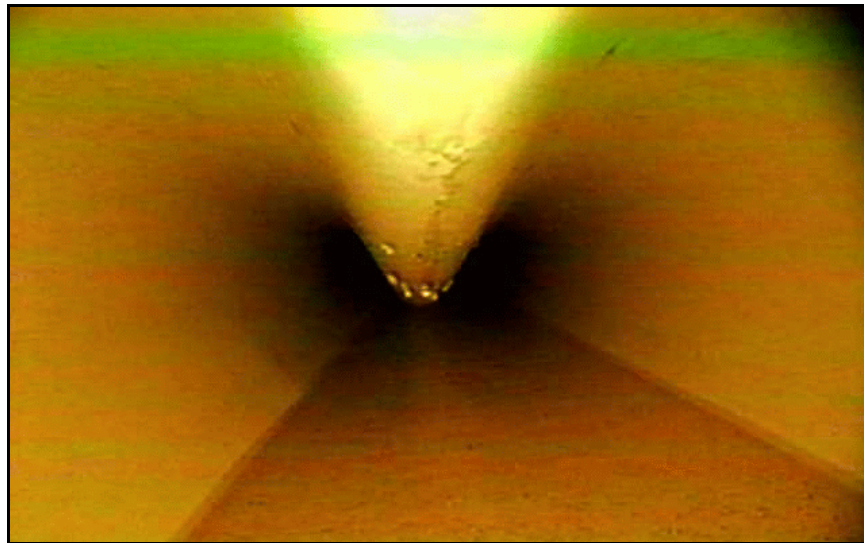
A portion of the temporary PVC diversion pipe was found to be severely deformed.
